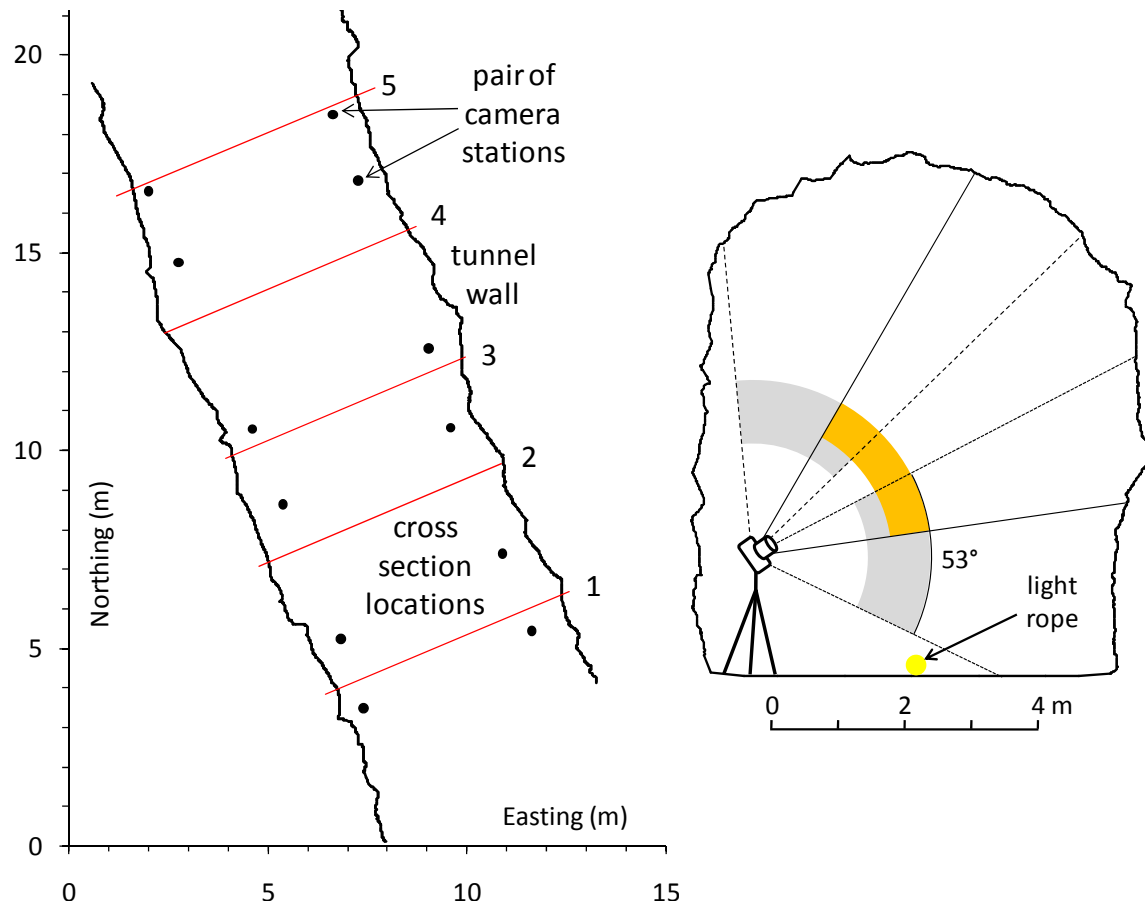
(a) Plan view of a section of the tunnel showing the location of 6 pairs of camera stations and 5 cross-sections and (b) typical tunnel cross-section showing overlapping photographs and location of light rope
